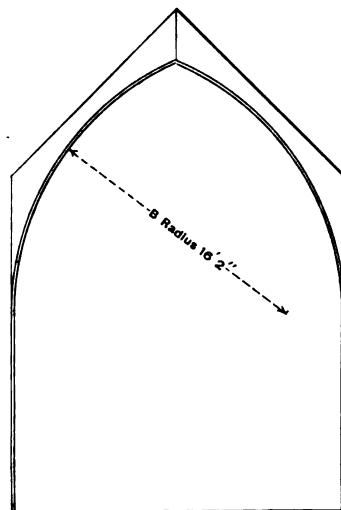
Elevation Showing Lines of Roof and Ceiling.
